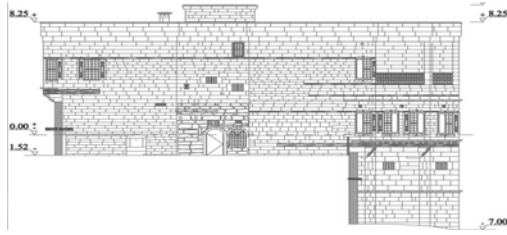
North Elevation (Yağmur, Y., 2017; Talas Belediyesi, 2010).
